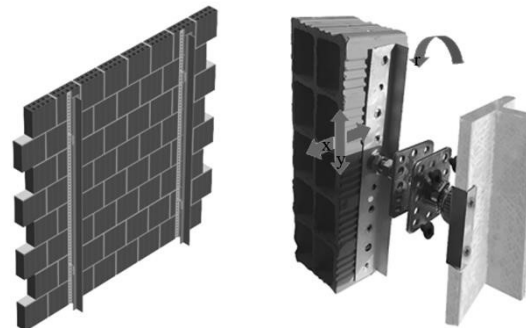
Connection of the threaded bushing – drilled plate to the *plate-spherical knot system
